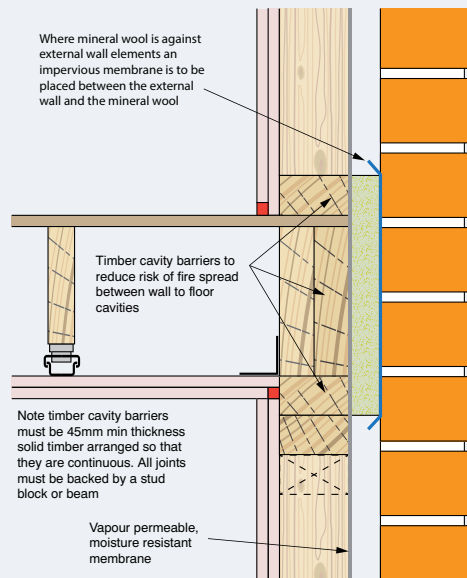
Fire-protected timber frame wall /floor junction with integral cavity barriers – beams parallel to wall Class 2 building.
